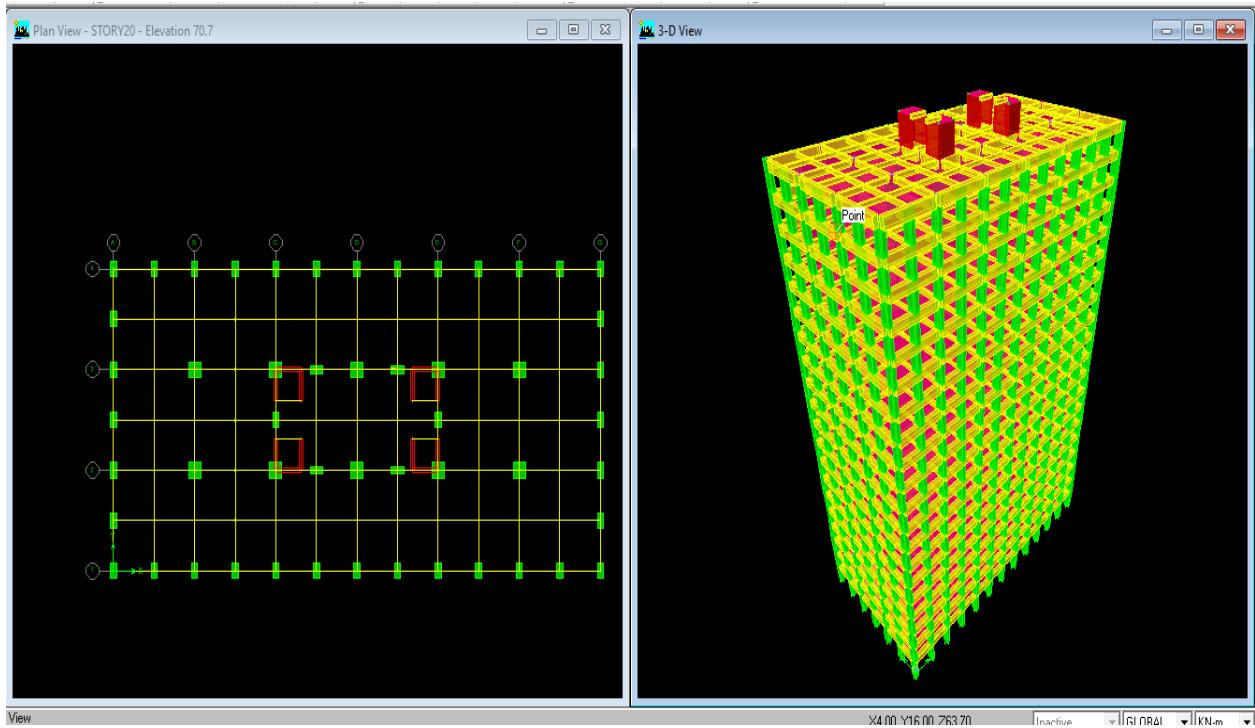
Plan view and 3-D view of 20 storied Tube-in-Tube structure building
